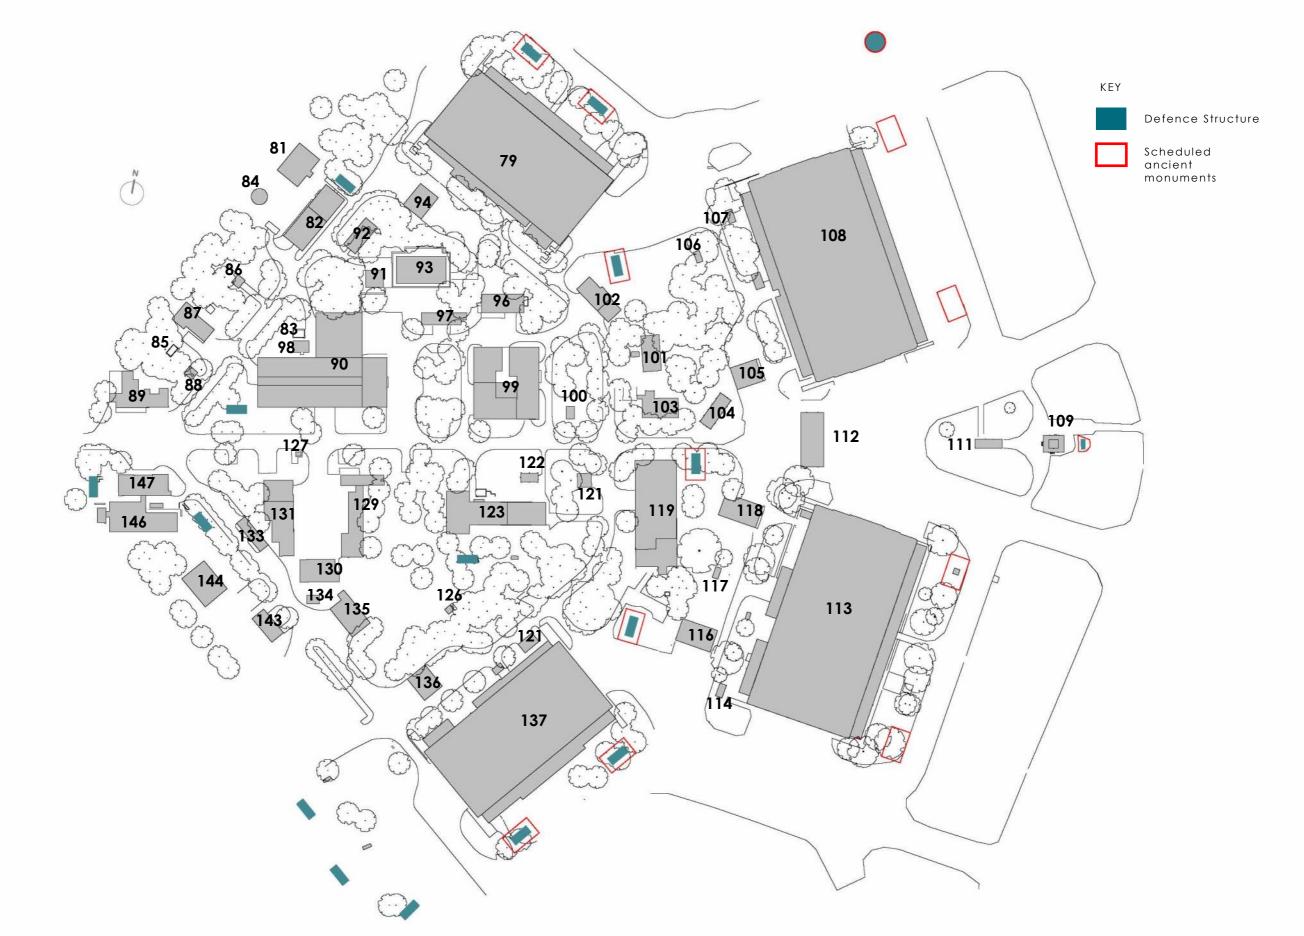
Site plan showing existing buildings, schedule ancient monuments and defence structures
